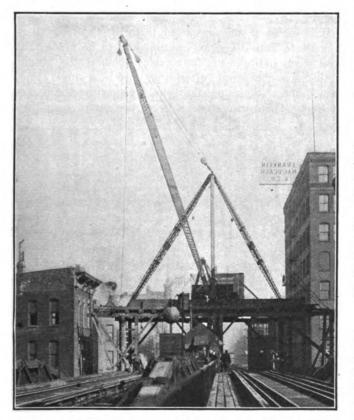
STIFF-LEG DERRICK OVER THE ELEVATED RAILWAY APPROACH
